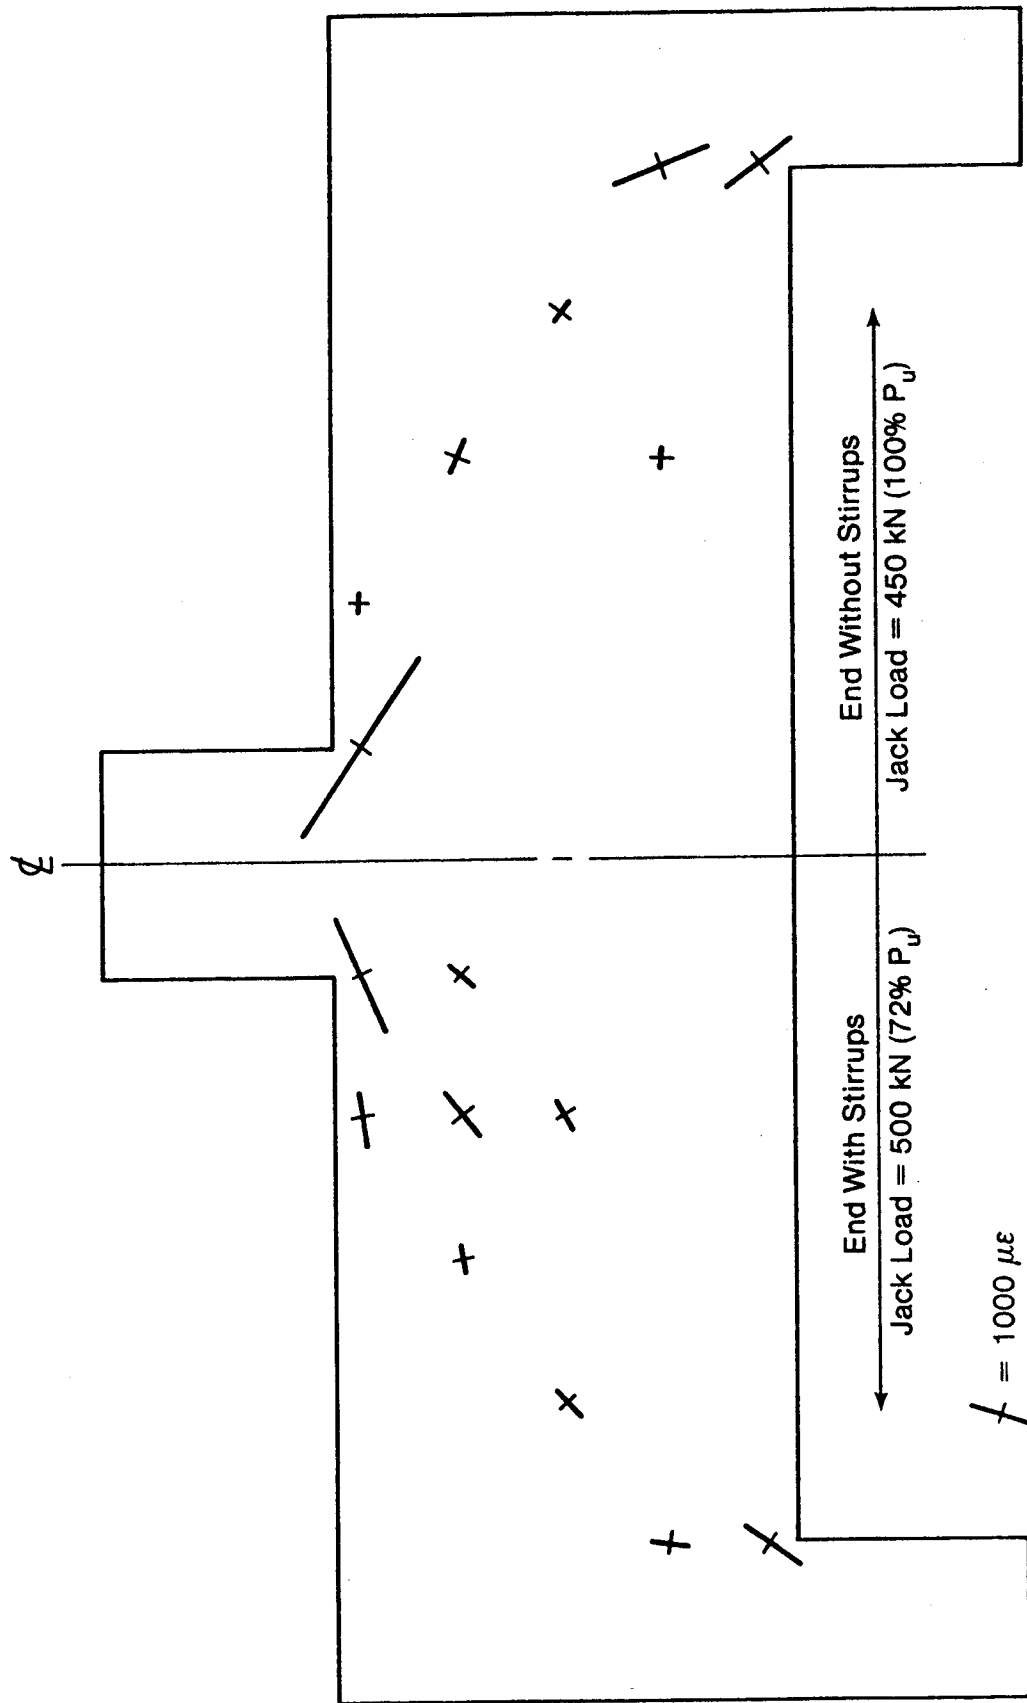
Beam 2/1.5 Concrete Compressive Strains
